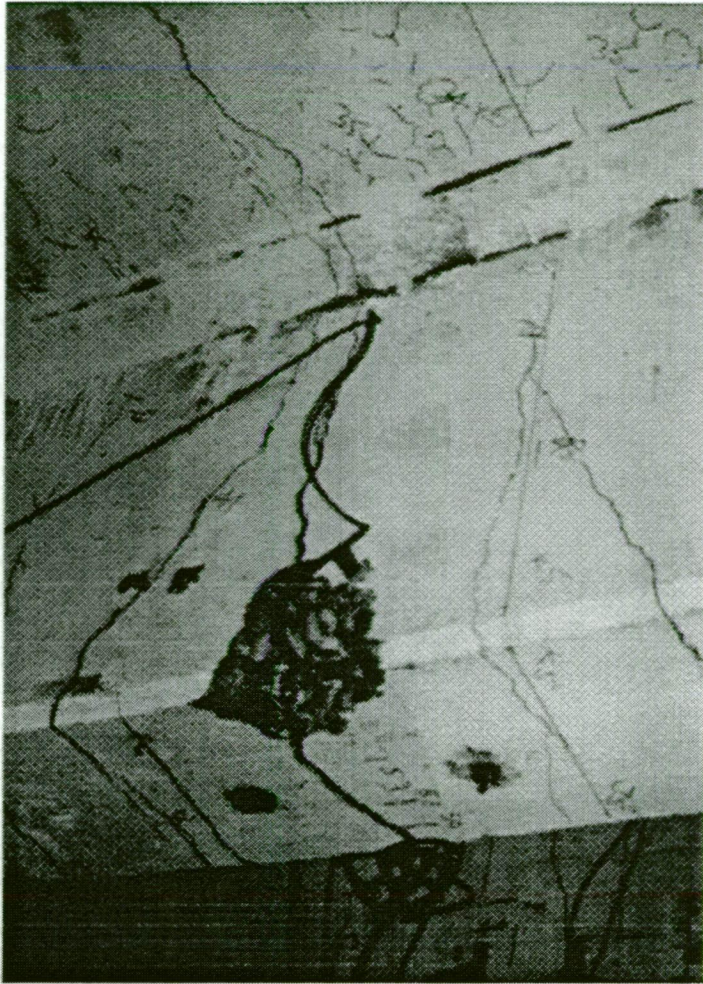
Cracking of Fifth Beam at Ultimate Load
